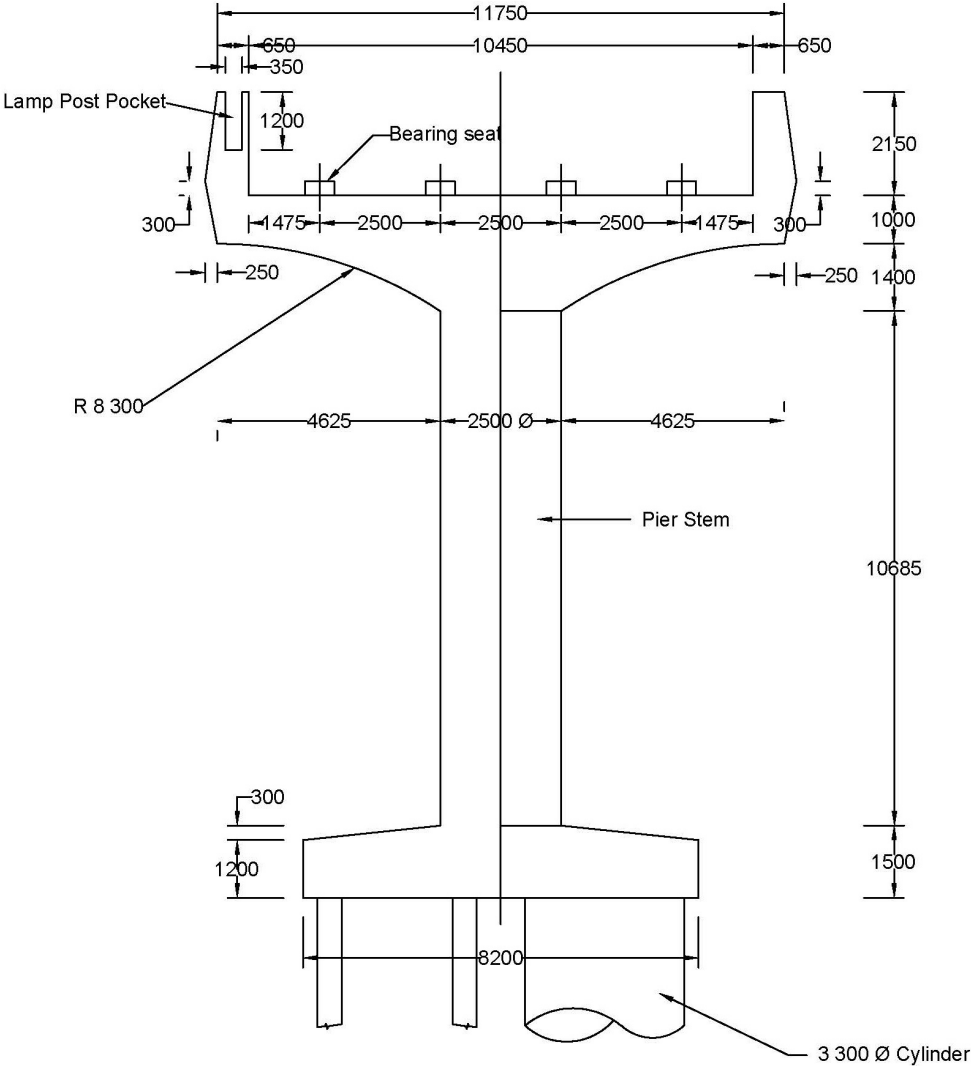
Kelanisiri bridge pier sketch (dimensions in mm)
